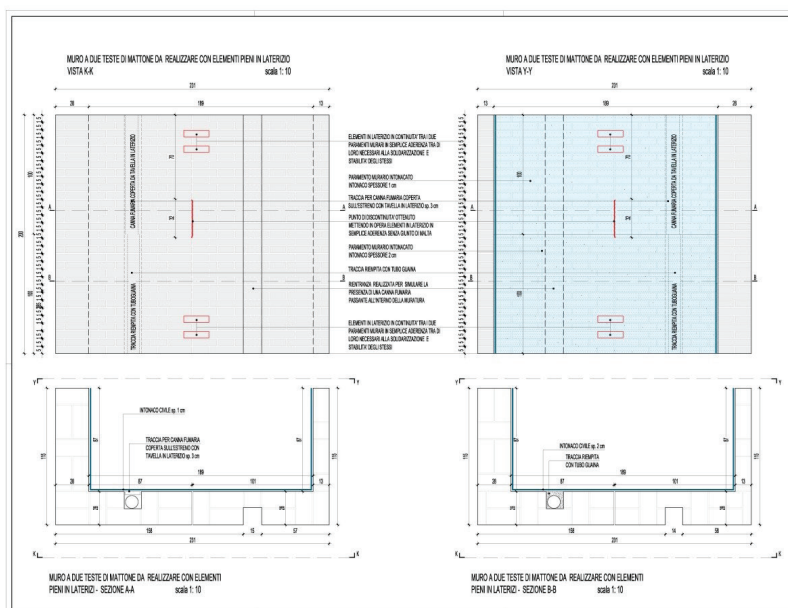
Layout of masonry specimen to be tested with thermal imager (sketched by Alice Catalini).
